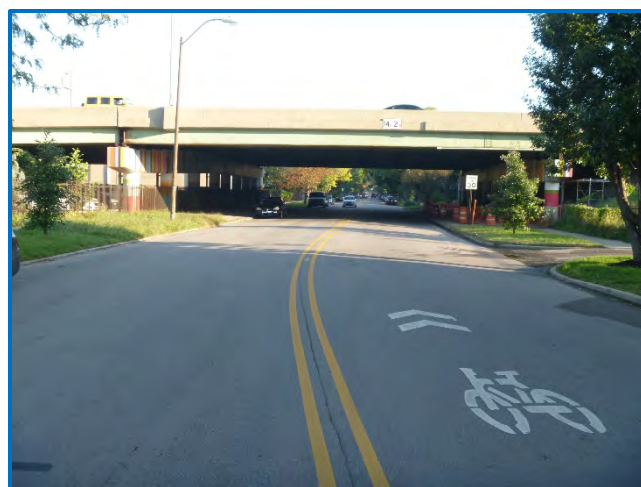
View of the I-65 bridge over Alabama Street facing north (10/3/2016).
